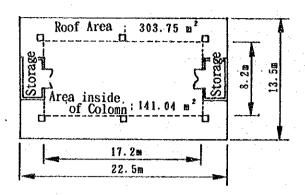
Roof Size and Location of Columns of Existing Boat House
